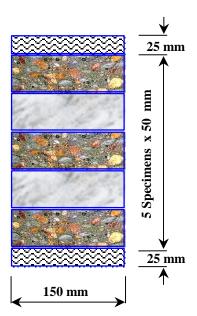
Concrete Specimens for Impact Test Obtained from Concrete Cylinders
